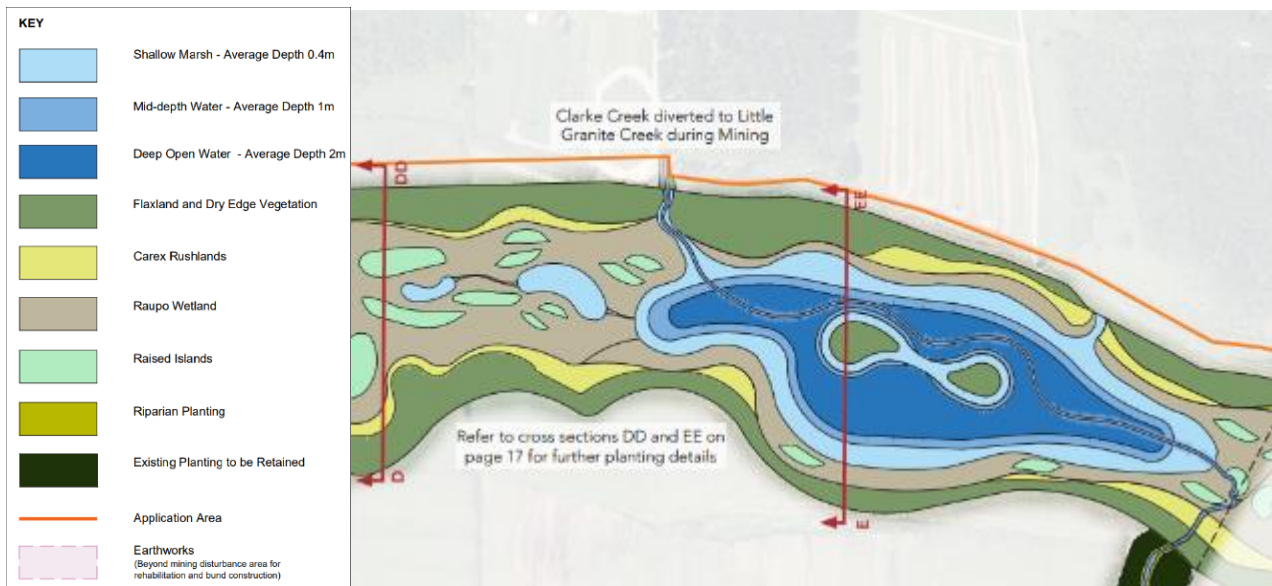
Indicative Wetland Formation and Planting Plan (Source: Landscape Mitigation Package)
